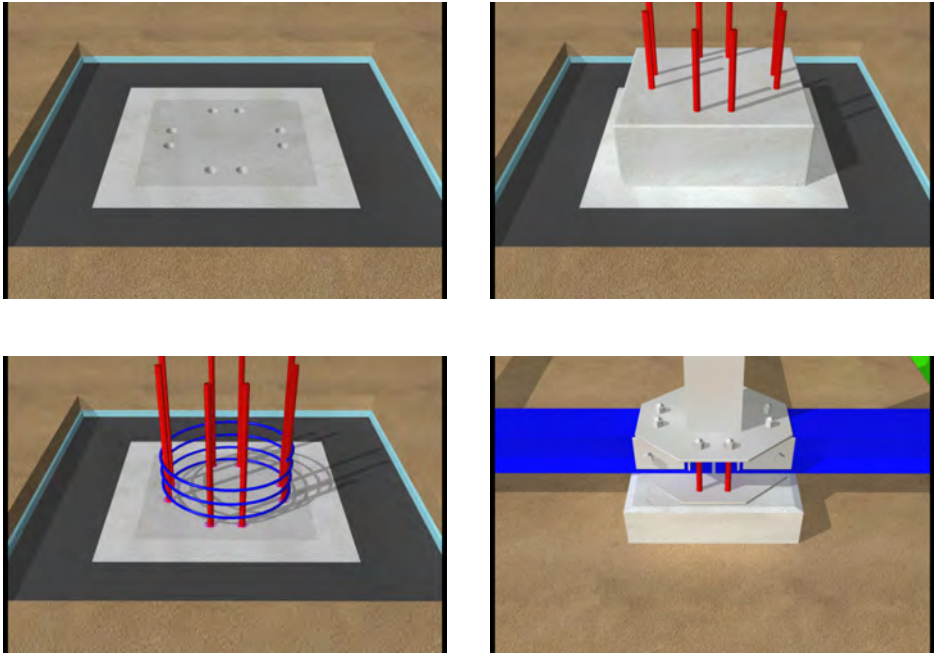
Structural connection between the Orchid House and existing building
